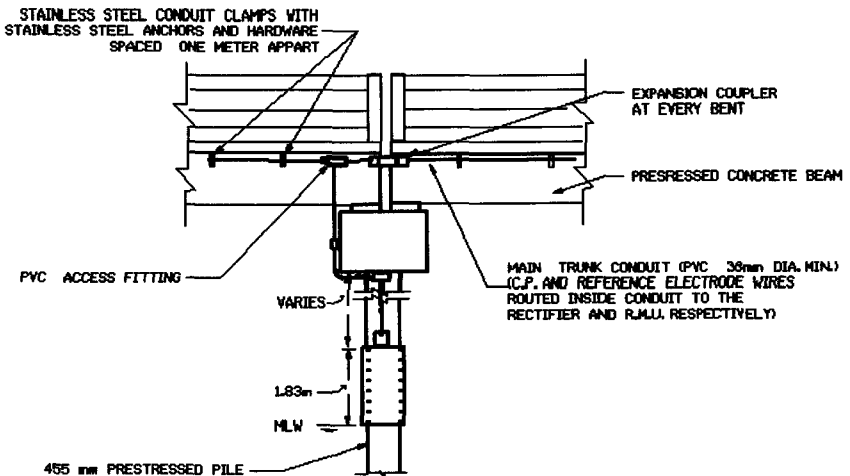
TYPICAL CATHODIC PROTECTION DETAIL
